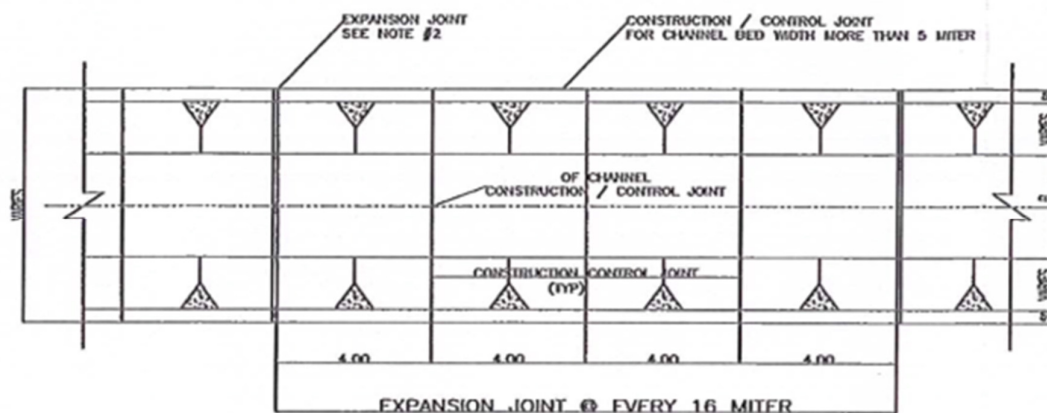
Key plan for expansion and construction joints based on the original proposal
